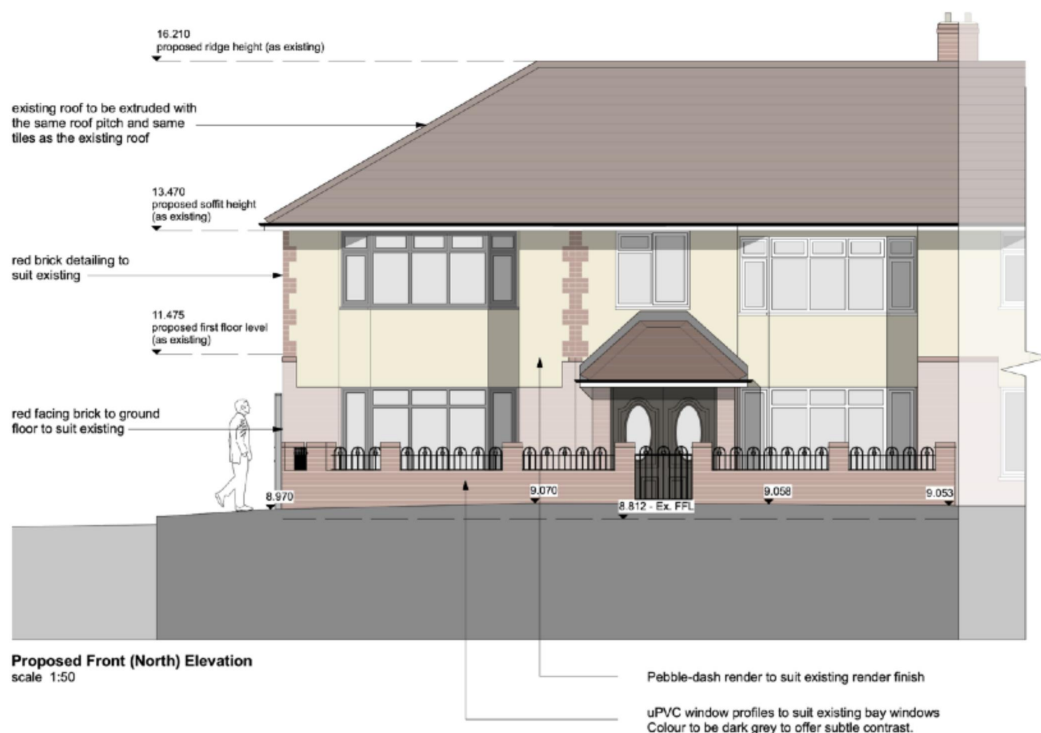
Proposed Front Elevation (Extract from Planning drawing: 10-151023-013)
